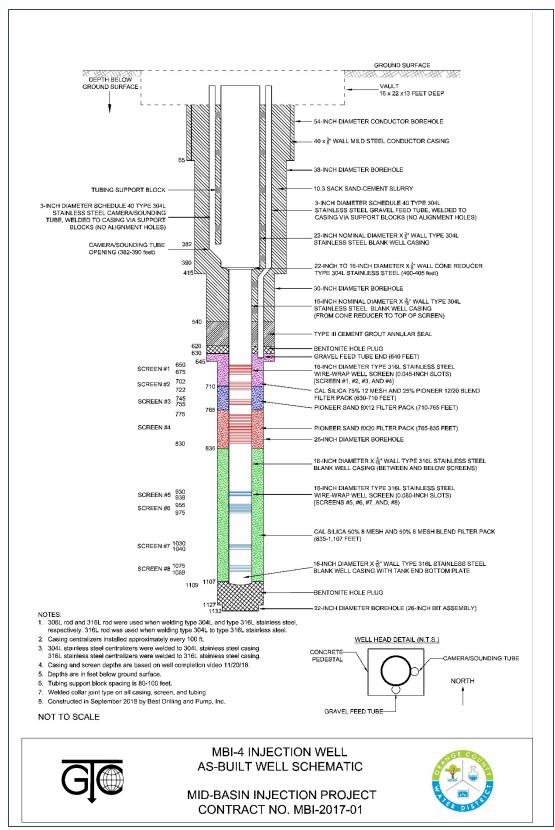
Injection Well MBI-4 As-Built Construction Diagram
